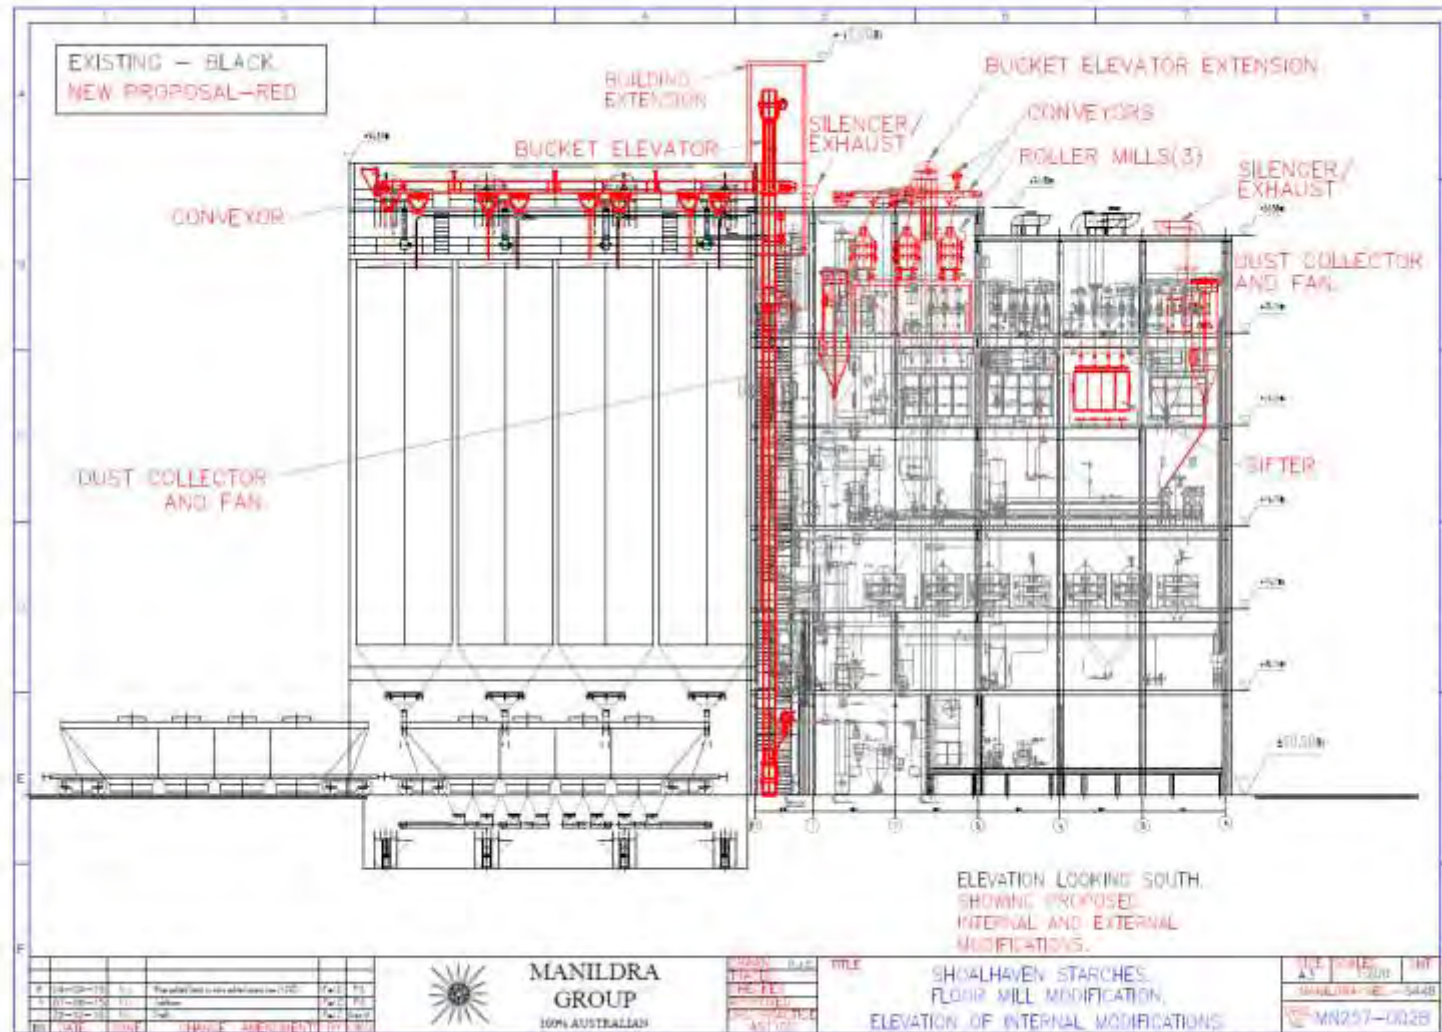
PROPOSED MODIFIED FLOUR MILL AND SILOS- ELEVATION PROFILE
